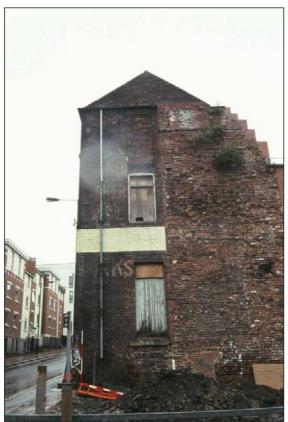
View of the south elevation of the west range (film C/S 2.33)
